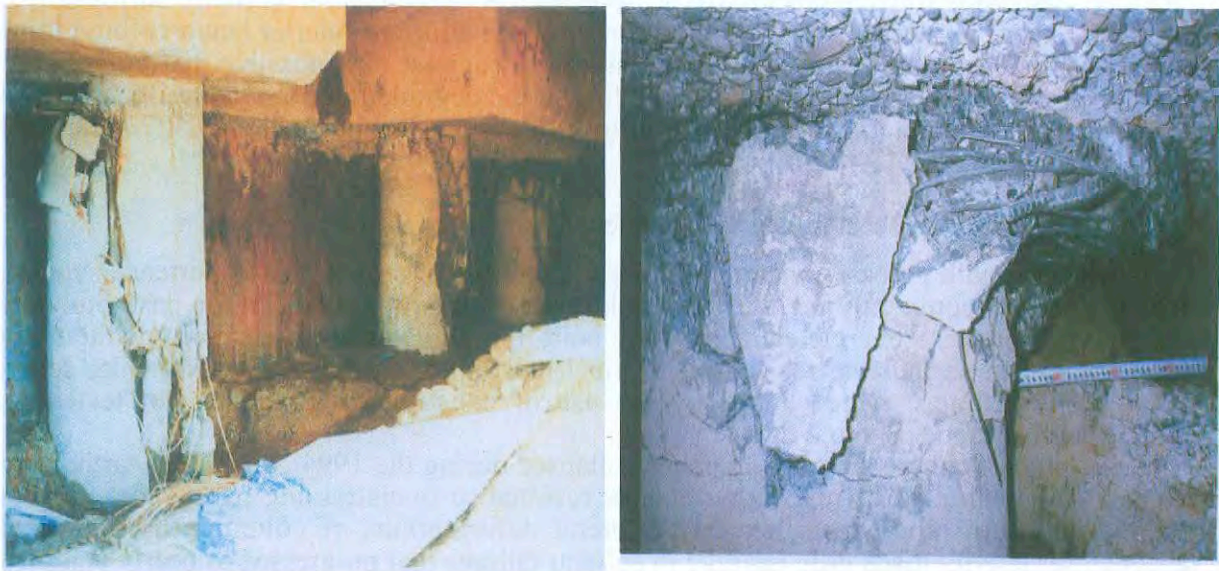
Failure of piles in the 1995 Kobe earthquake disaster. (Left) Failure of piles in reclaimed land. (Right) Failure of pile by lateral spreading of liquefied soil.
